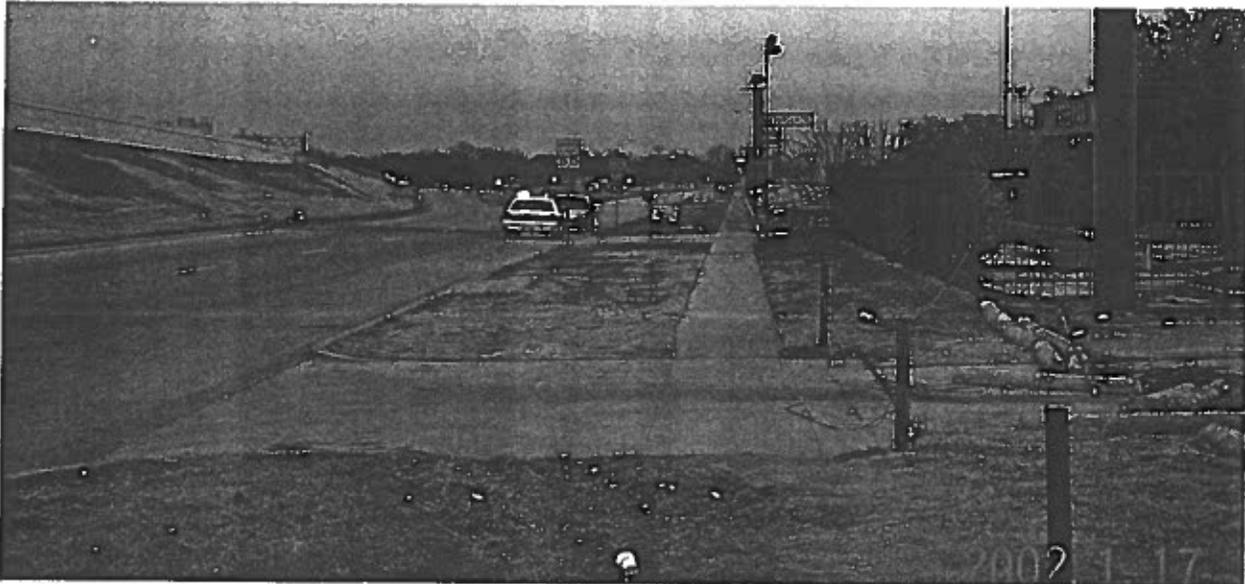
Looking south from Glenview Drive at south-bound frontage road of IH-820. As east of the interstate, areas adjacent to the existing right of way have been extensively developed.
